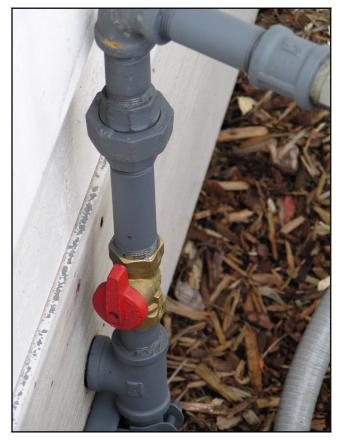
Manual Fuel Shutoff Valve (outdoor installation shown)
